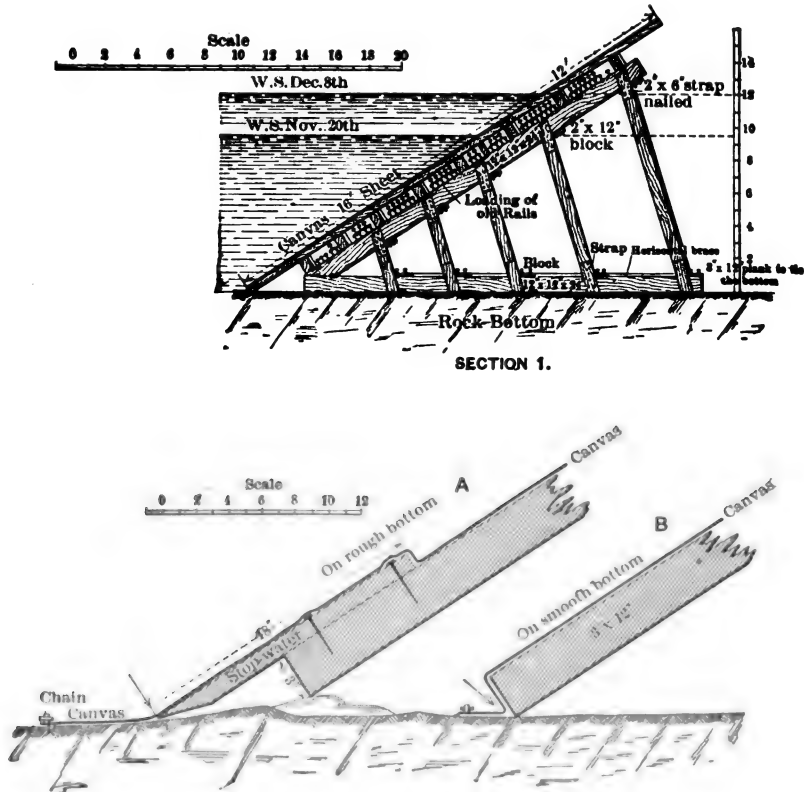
DETAILS OF CANVAS AND PLANK BULKHEAD.
